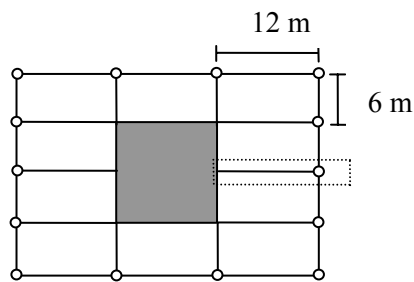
Typical plan of a multi-storey frame model and Model cross section adopted
